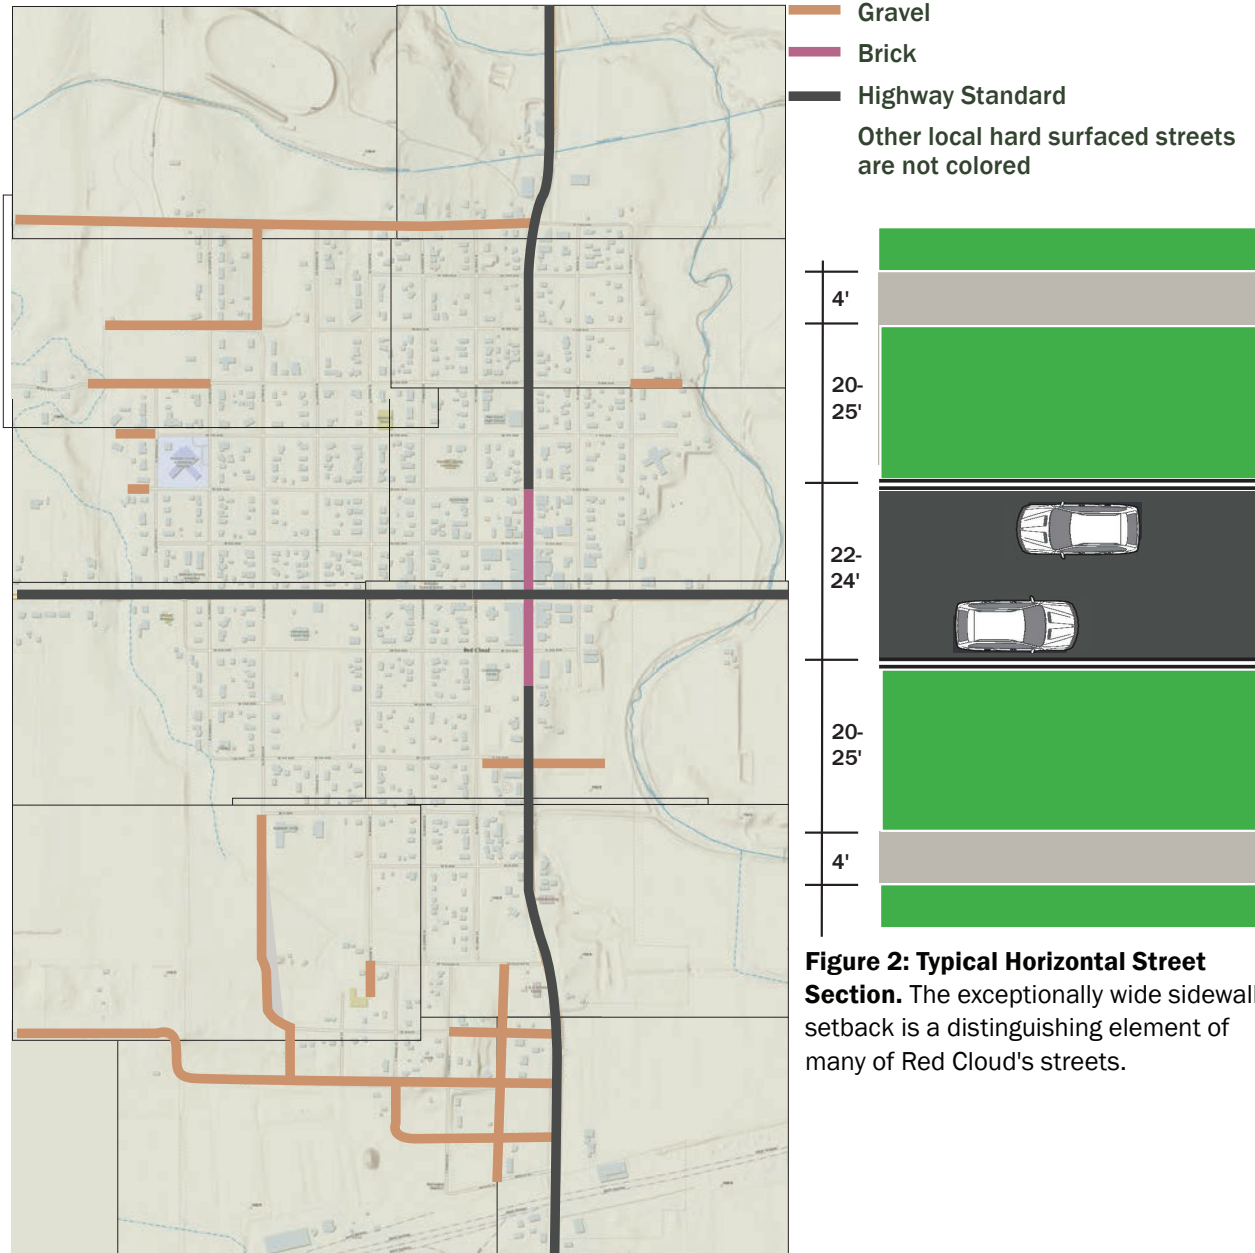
Typical Horizontal Street Section. The exceptionally wide sidewalk setback is a distinguishing element of many of Red Cloud's streets.
